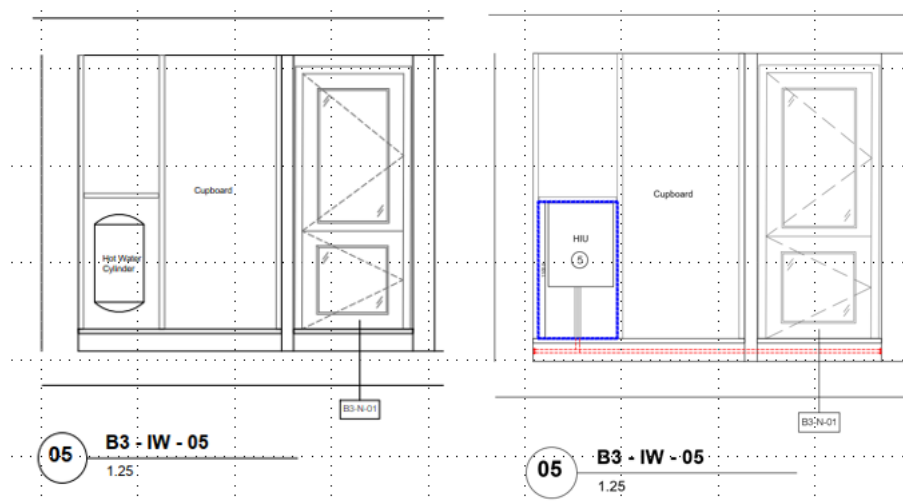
Existing (left) and proposed (right) elevations of the existing water tank and proposed HIU in a typical location within the cupboards
